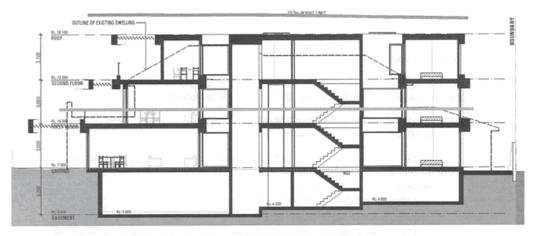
Section detailing the existing and proposed buildings with the two height limits
